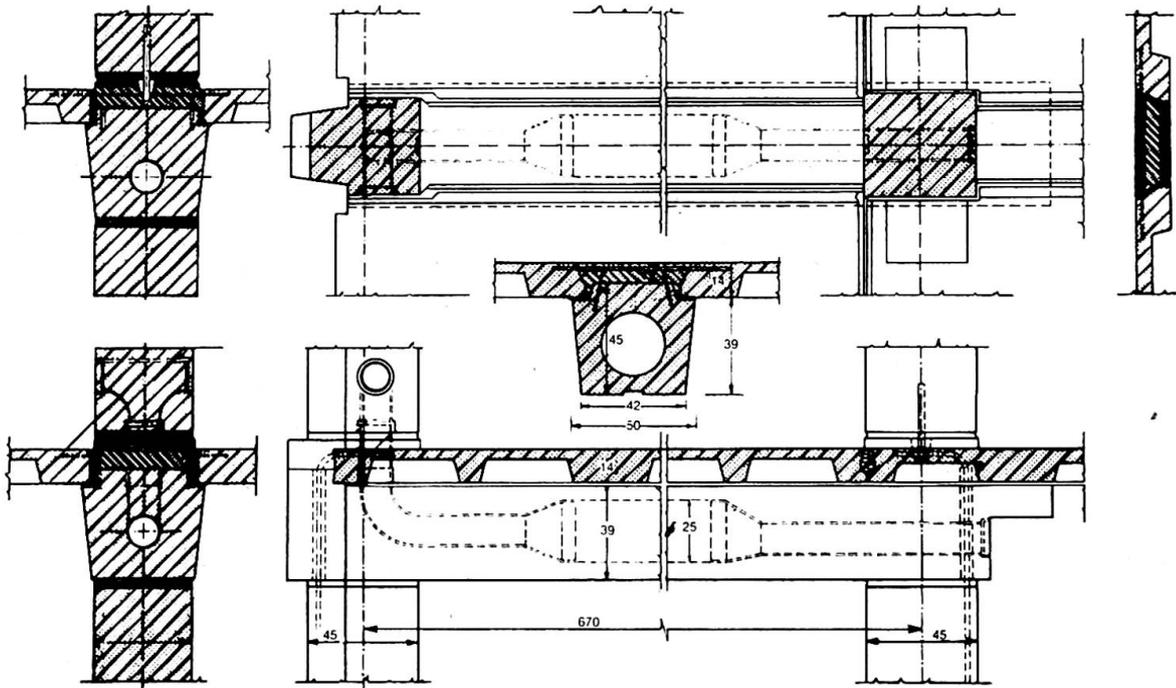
Connection of cross-beams, columns and floor beams.
